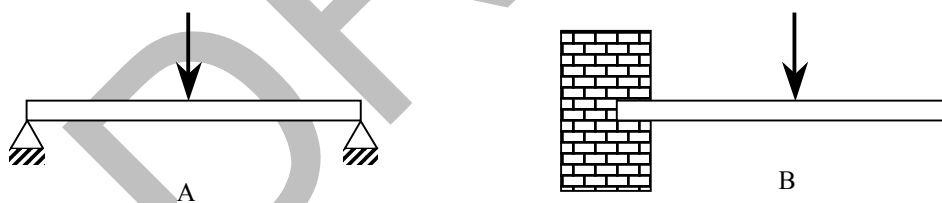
Two beams are shown above. A represents a simply supported beam with a single point load, while B represents a cantilever anchored to a wall with a single point load.
